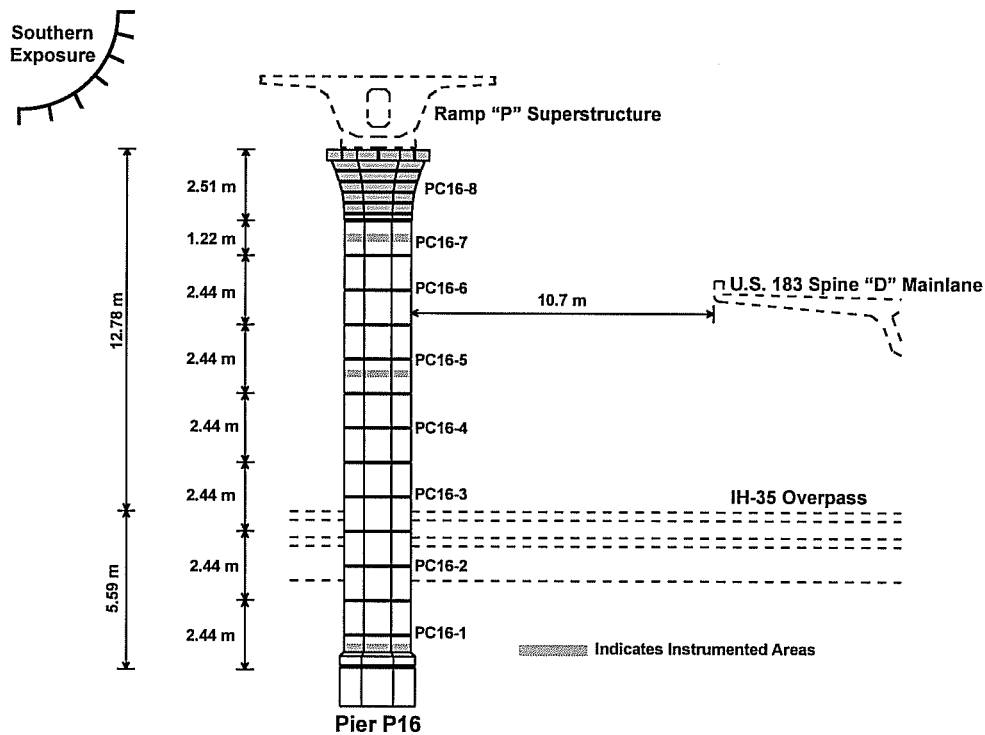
Instrumented areas of pier P16 relative to surrounding structures' locations.
